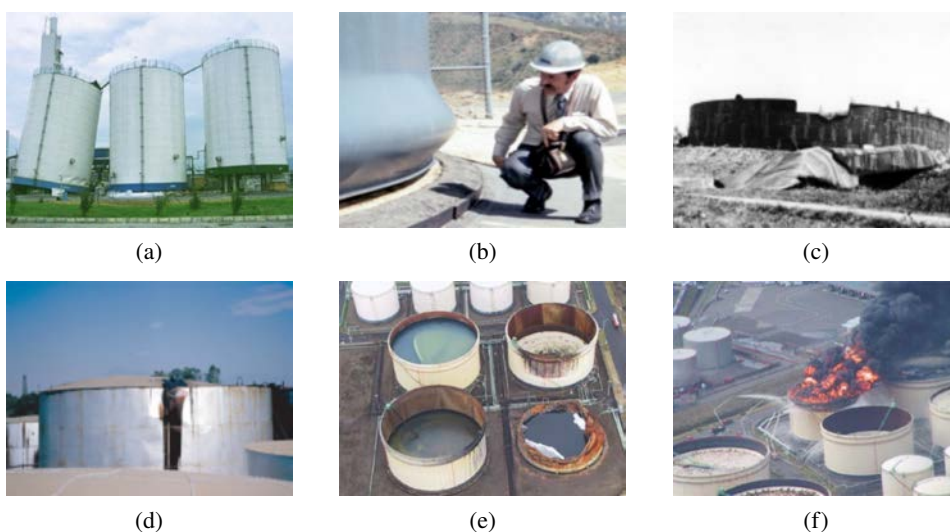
Earthquake damage cases of liquid storage tank: a) support system failure, b) elephant foot flexion, c) roof failure, d) wall failure, e) liquid leakage, f) fire
